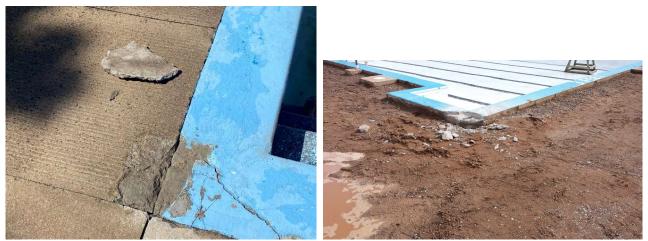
Existing Damaged Pool Coping (From Provided Pool Conditions Documentation)
